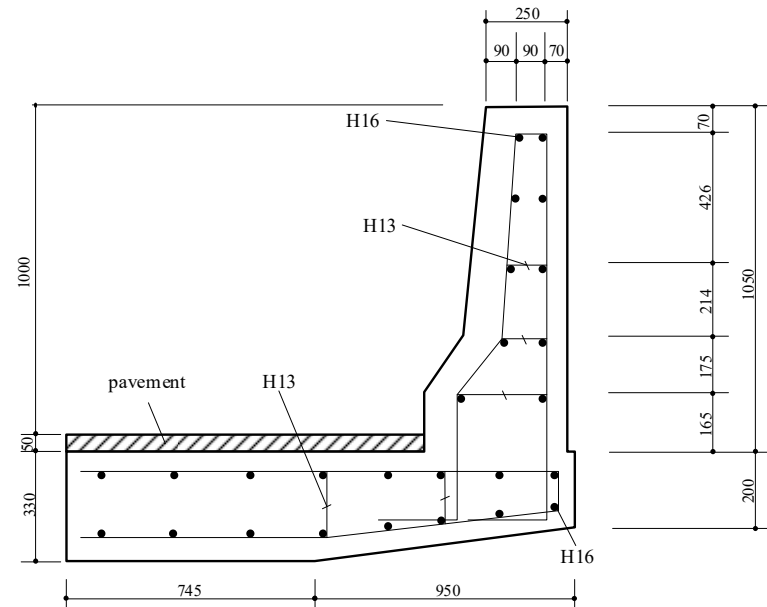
The geometry and rebar arrangement of the reinforced concrete barrier (unit: mm).
